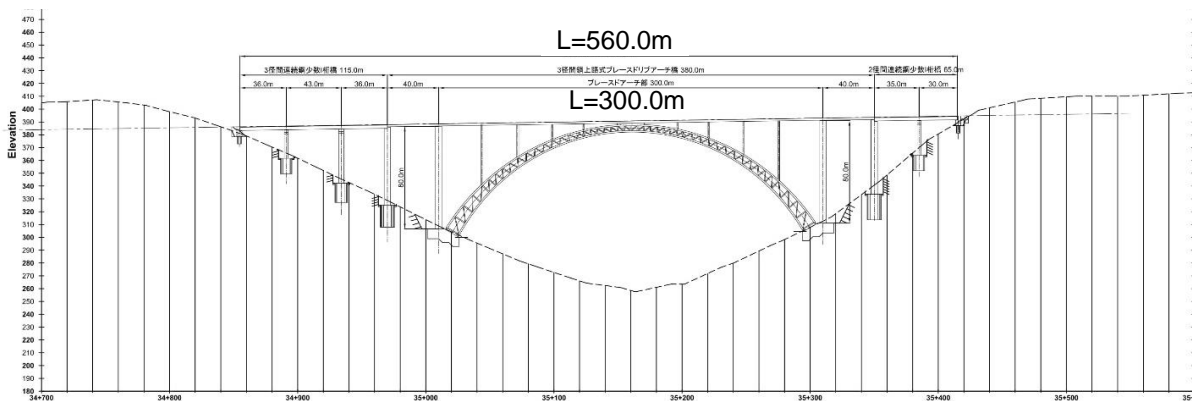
Long Span Bridge-2 (Steel Arch Bridge)
